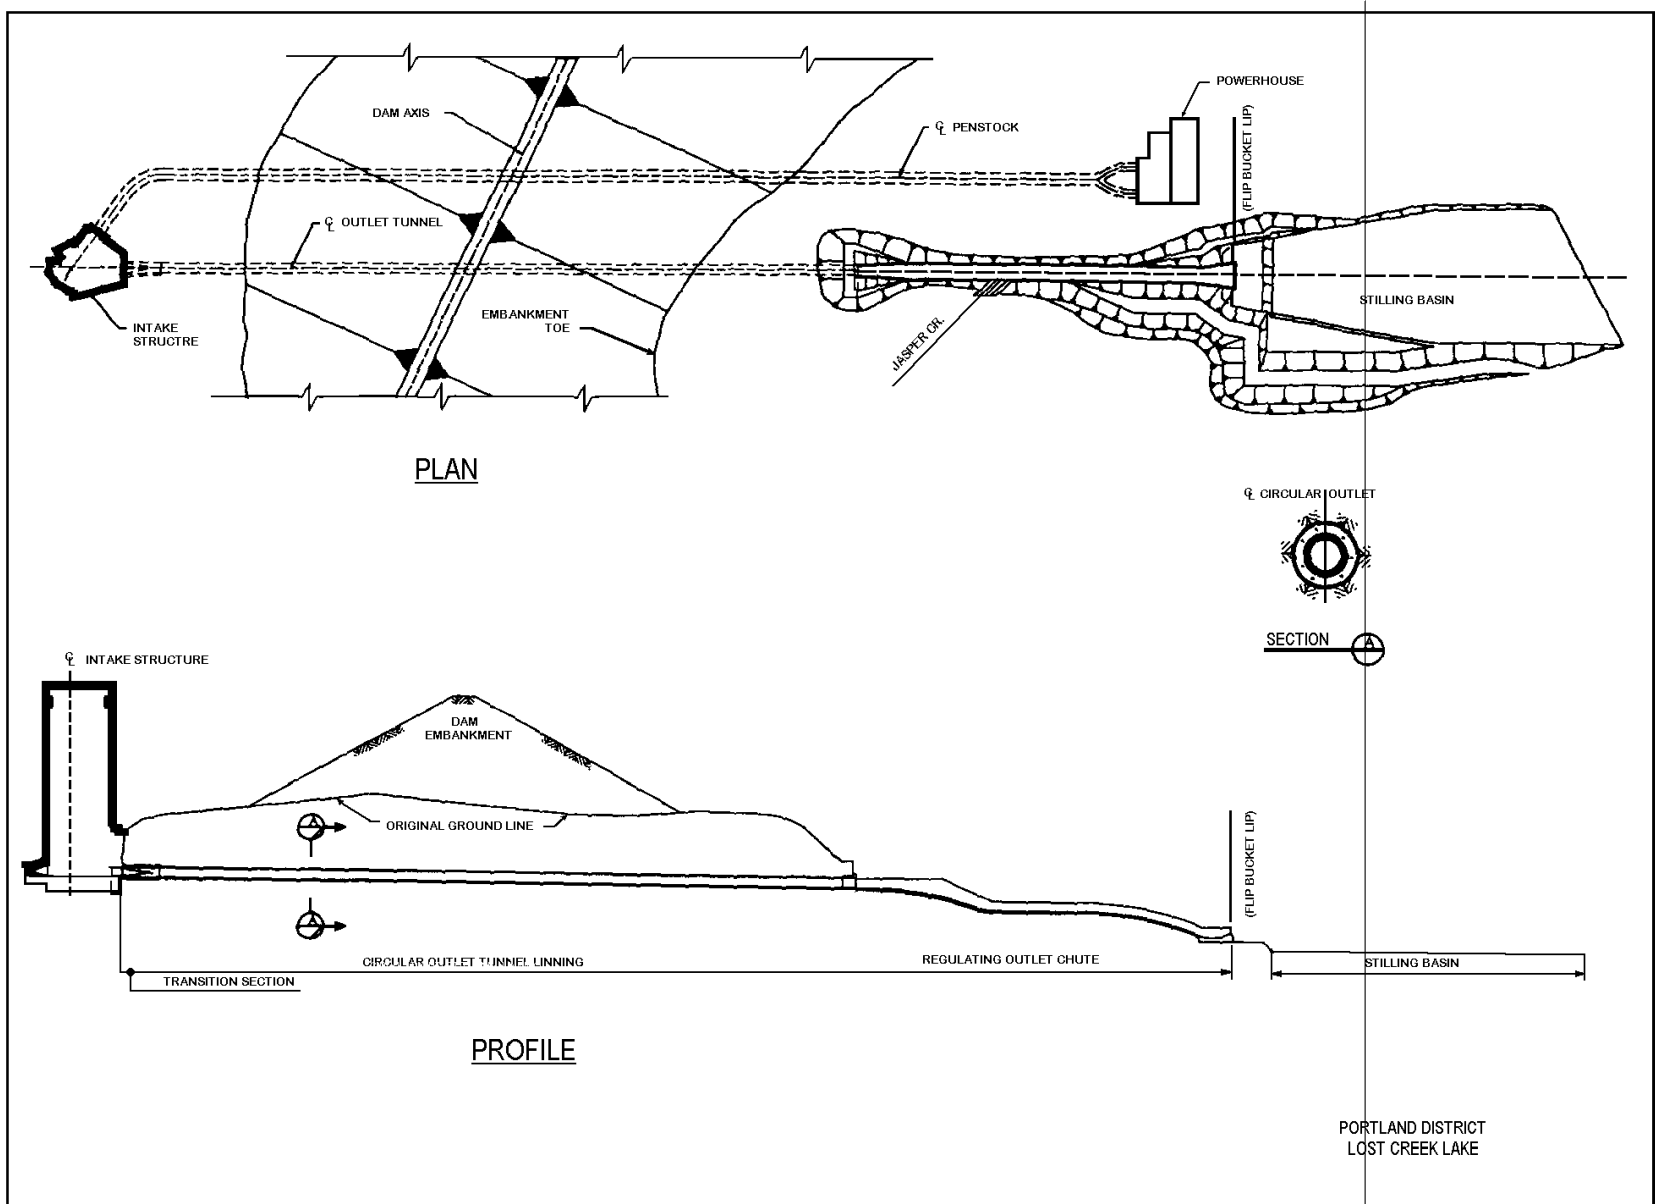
Outlet works through abutment, Lost Creek Lake, Oregon
